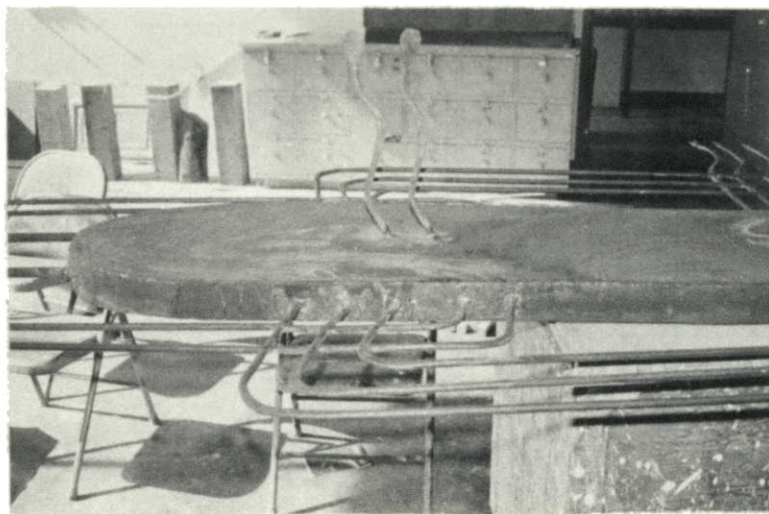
Rods forged and welded to the surface of the closed form
